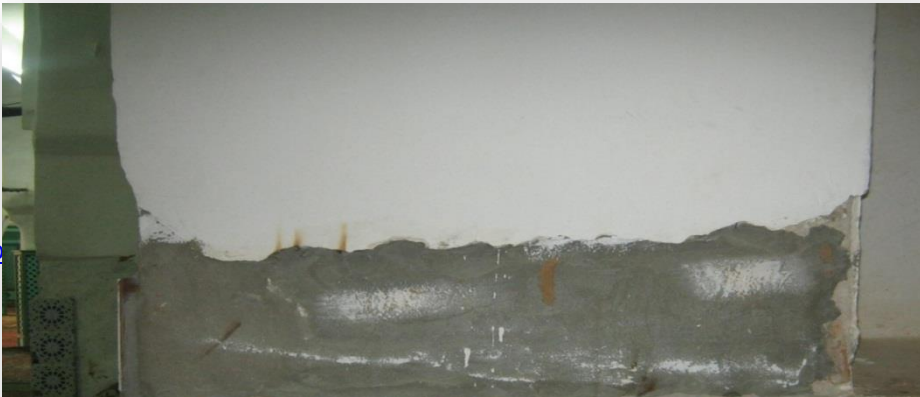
The original roofing and additions under the ceiling with gypsum.The work of the researcher.
